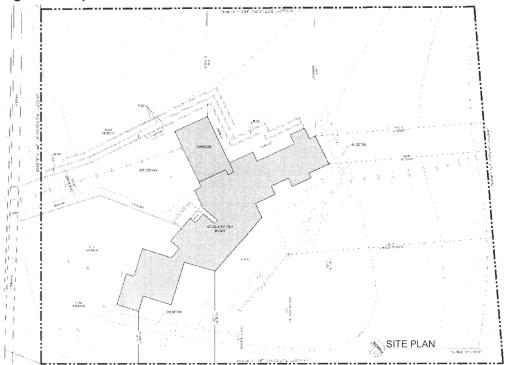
Project Site Plan (Source: Plan Set prepared by J.C. Engineering, dated 07-13-20)
